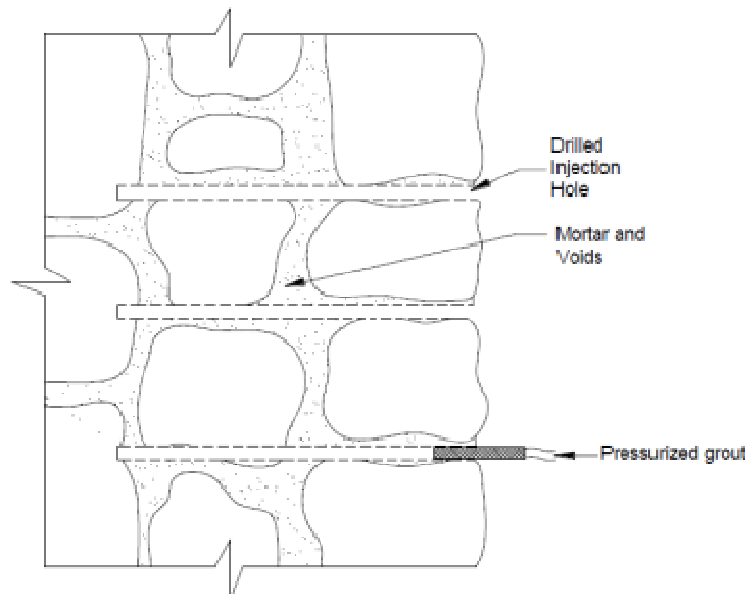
grouting techniques applied to restore filling (source Dez Ab 2011)
